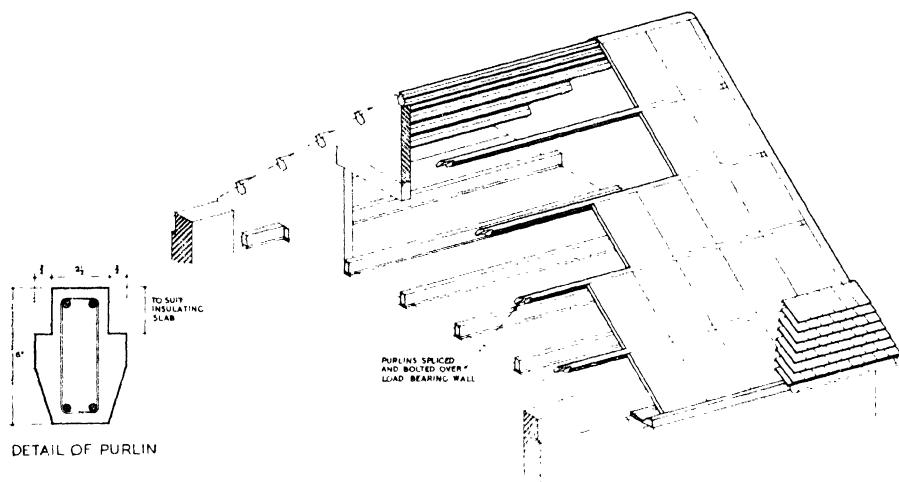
CONCRETE CONSTRUCTION FOR TILE- OR SLATE-COVERED PITCHED ROOFS
